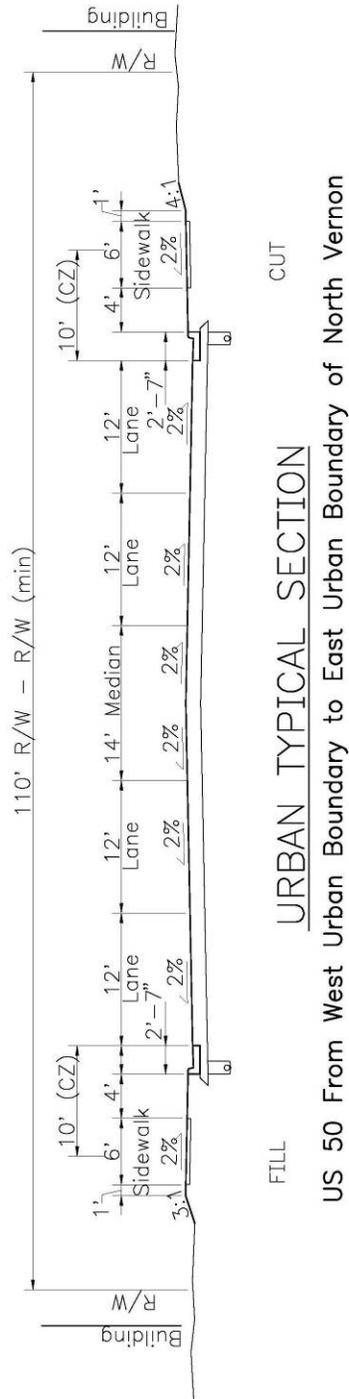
Urban Typical Section, Eastern Section Added Travel Lanes Through North Vernon
